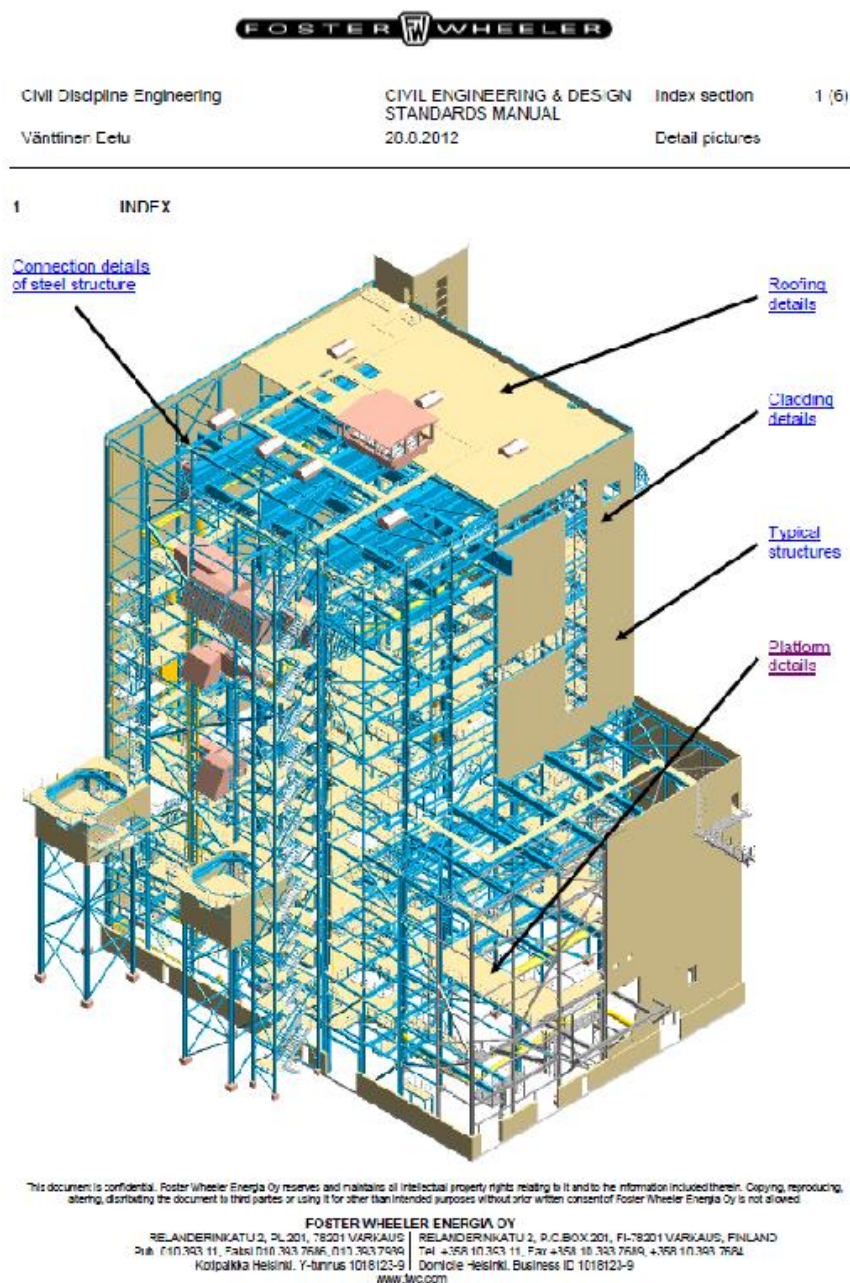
First page of the detail picture –library with links to different sections of a boiler house (Vänttinen 2012, Detail Pictures.)
